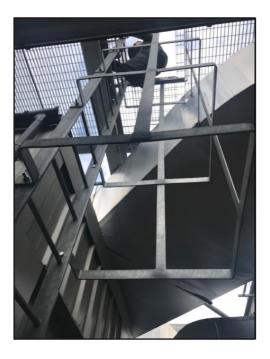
Rooftop 'hatch', which could be used to lift up to roof top level the PV panels, and rails (if using)
